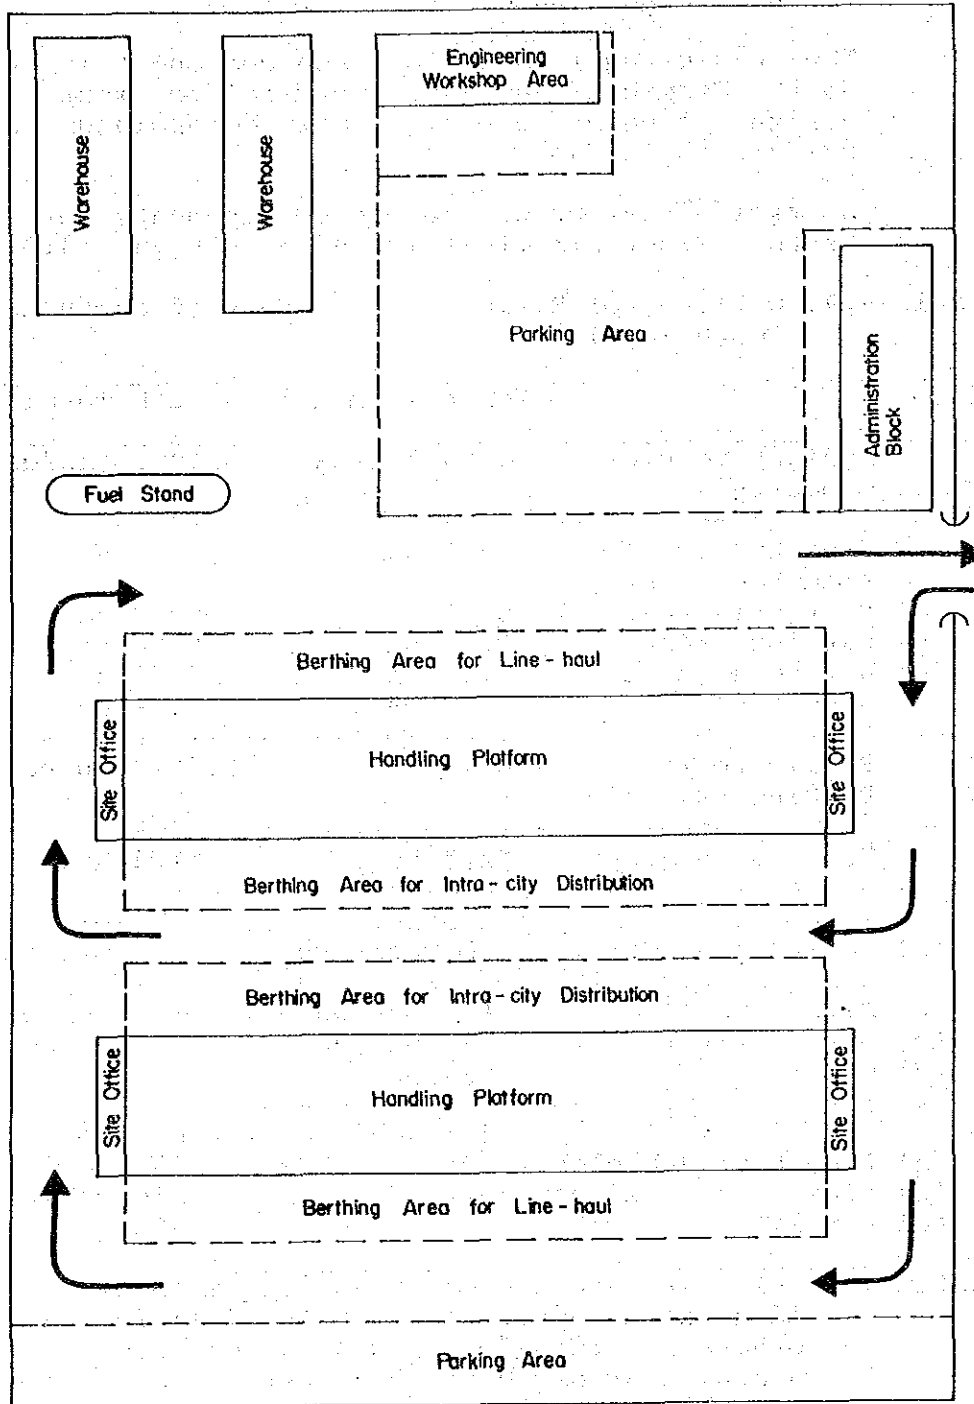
Typical Layout Plan for the North or South Terminal
